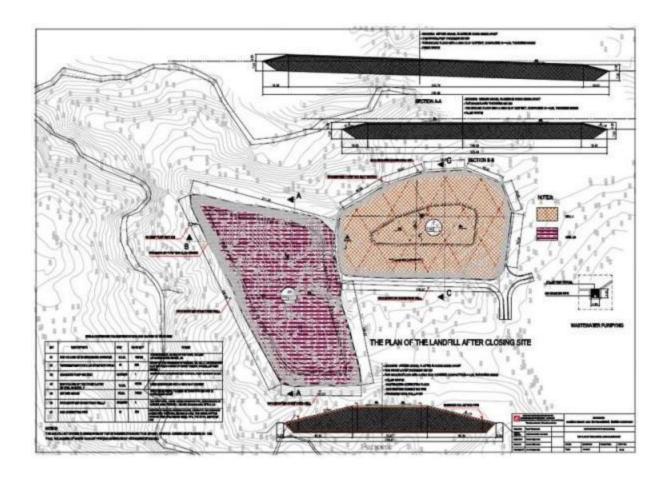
The Current Plan and Cross Sections of the Cu Ebur Dumpsite
